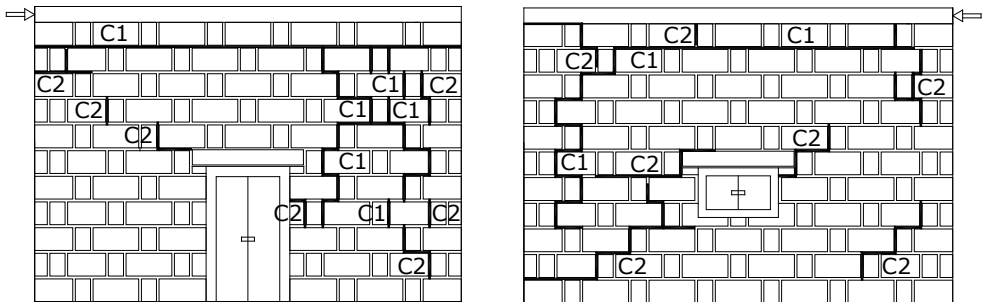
Model of masonry type D (HM-3) after testing under static load
